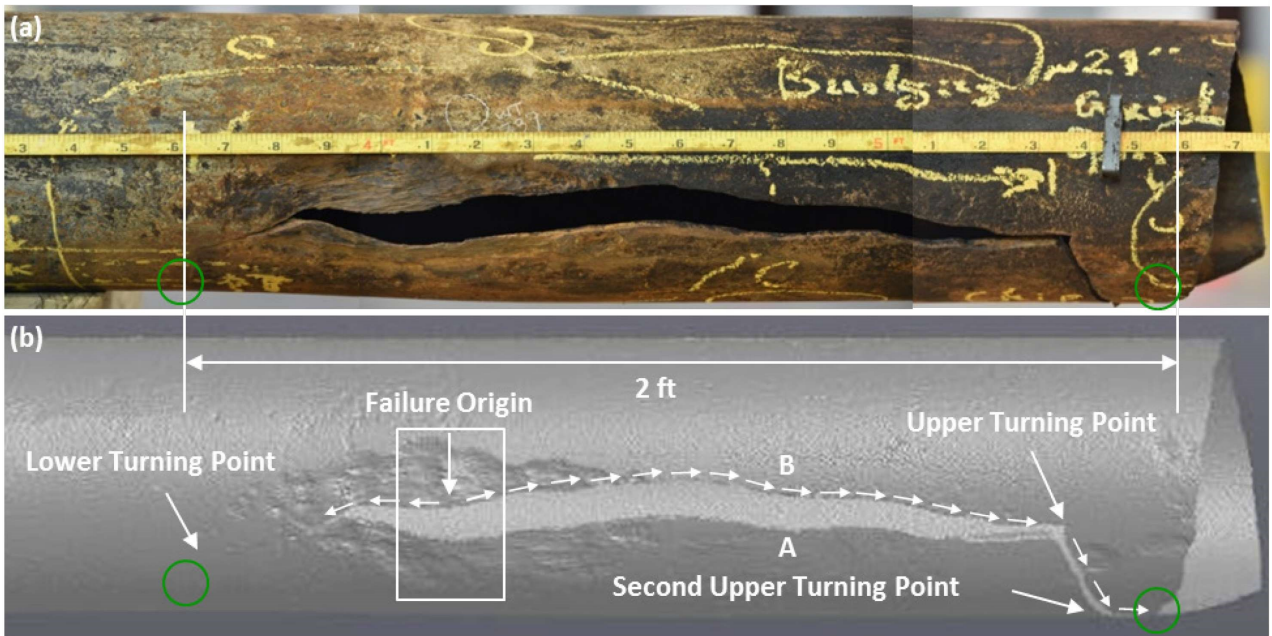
(a) Field Photo and (b) Laser Scan Indicating the Origin, Lower and Upper Turning Points, and Lower and Upper Arrest Points
